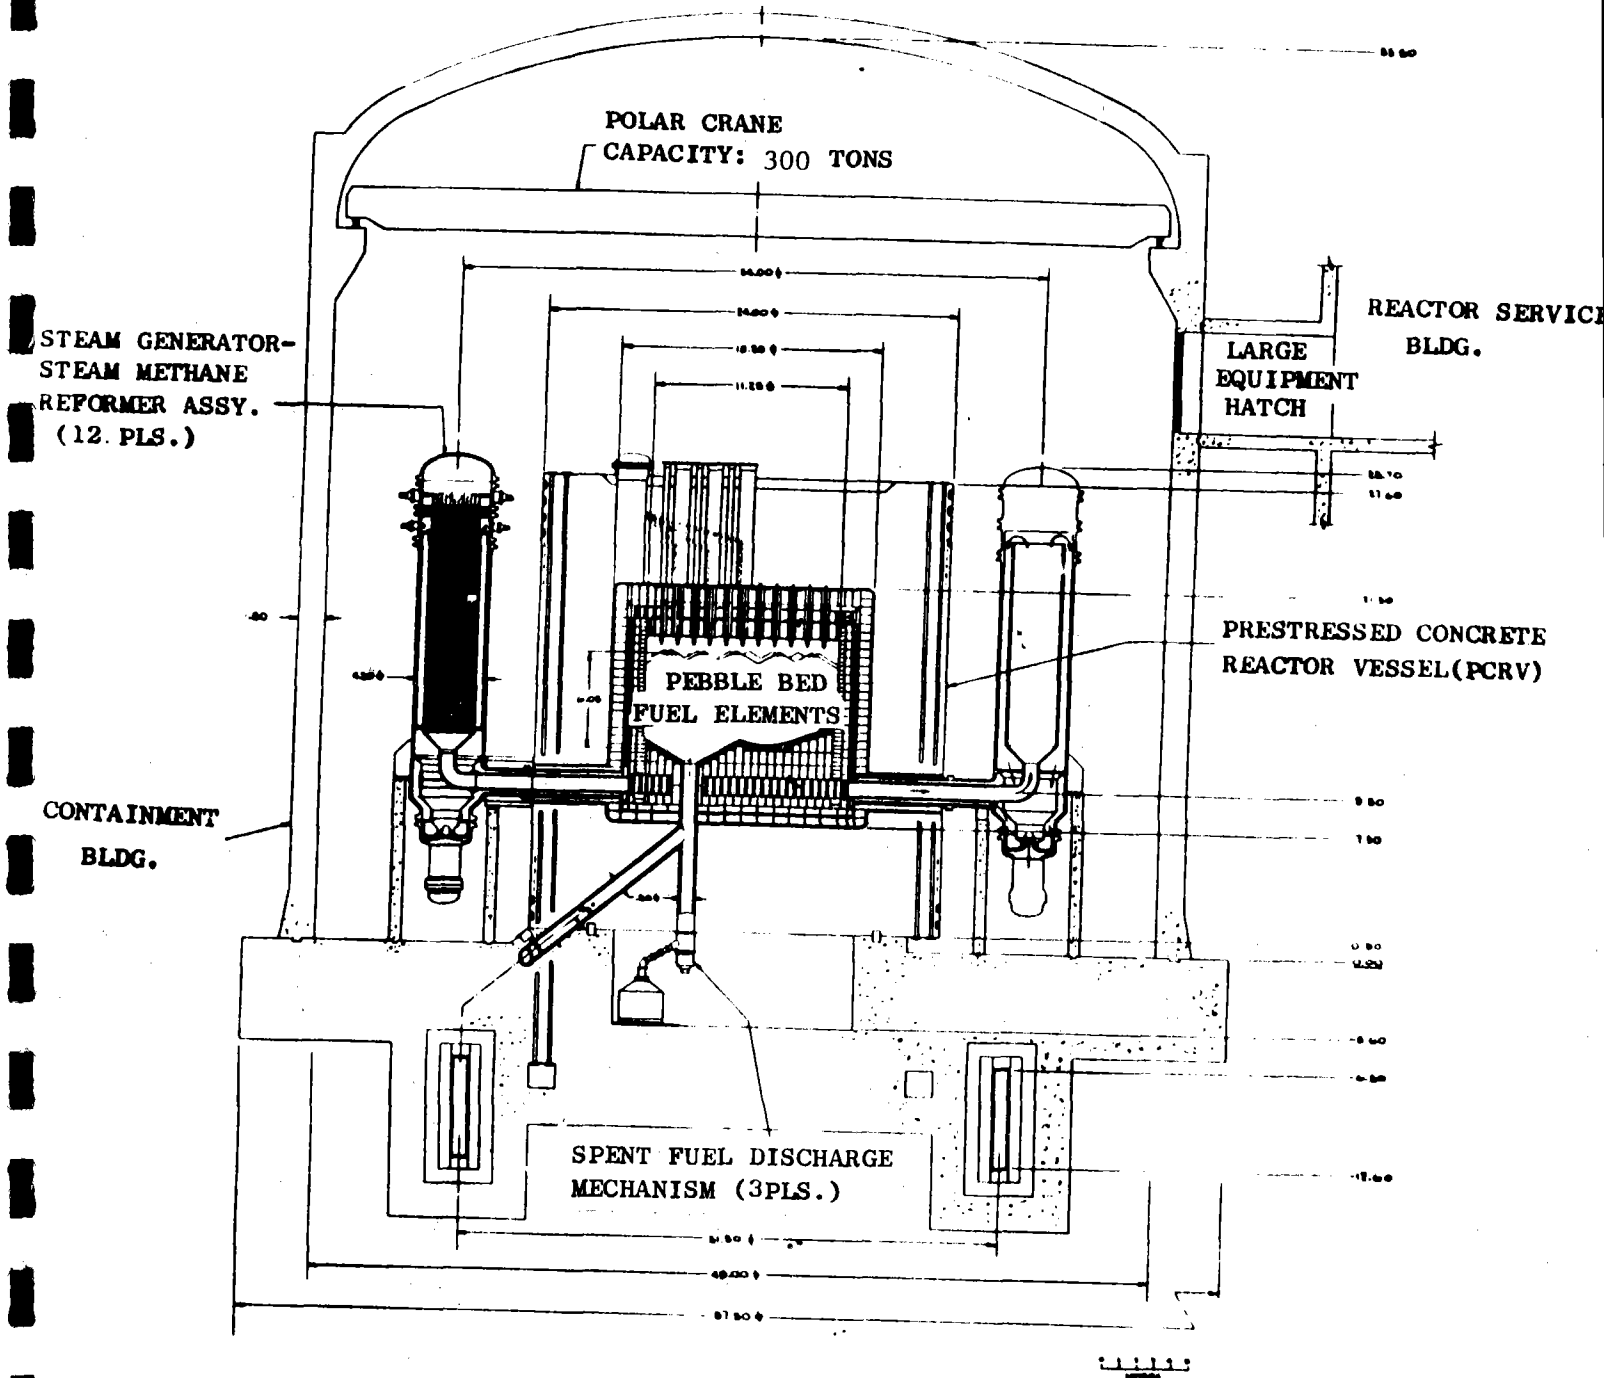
Details of Pebble Bed Reactor and the Reformer-Steam Generator Assembly.
